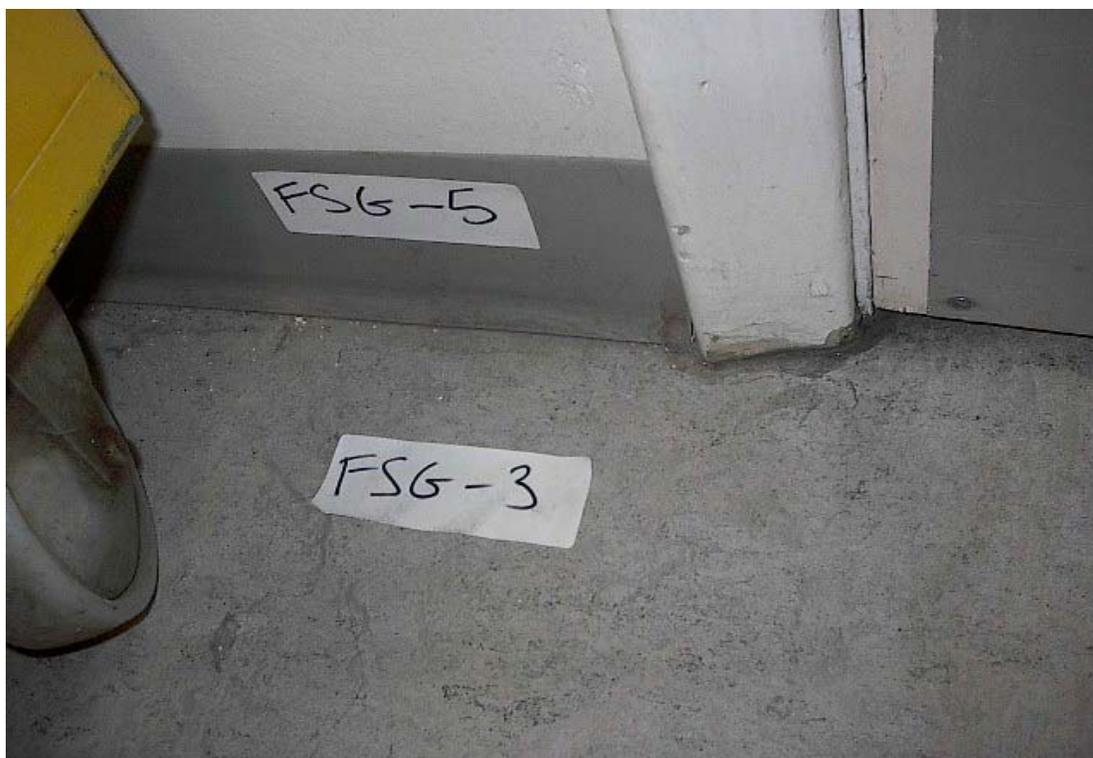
Sheet flooring and baseboard composite, Samples 3, 4 and 5.
